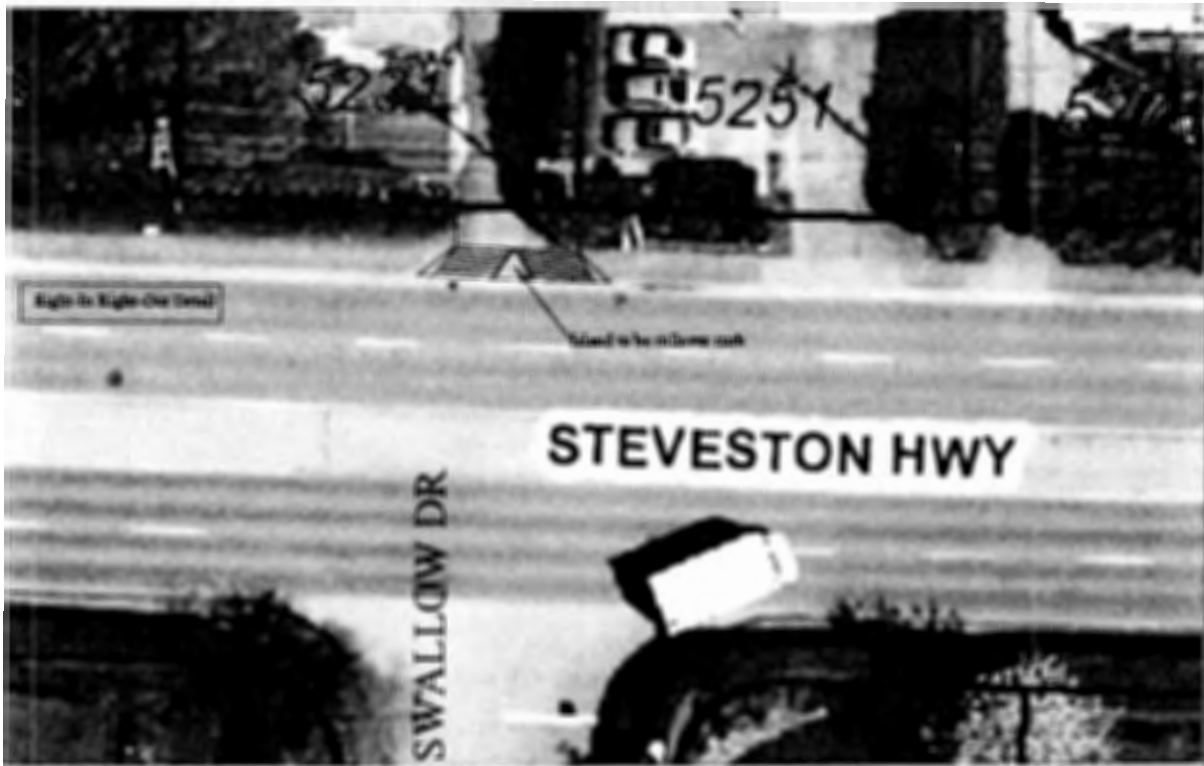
Concept drawing of left-turn restrictions at development driveway on Steveston Highway
